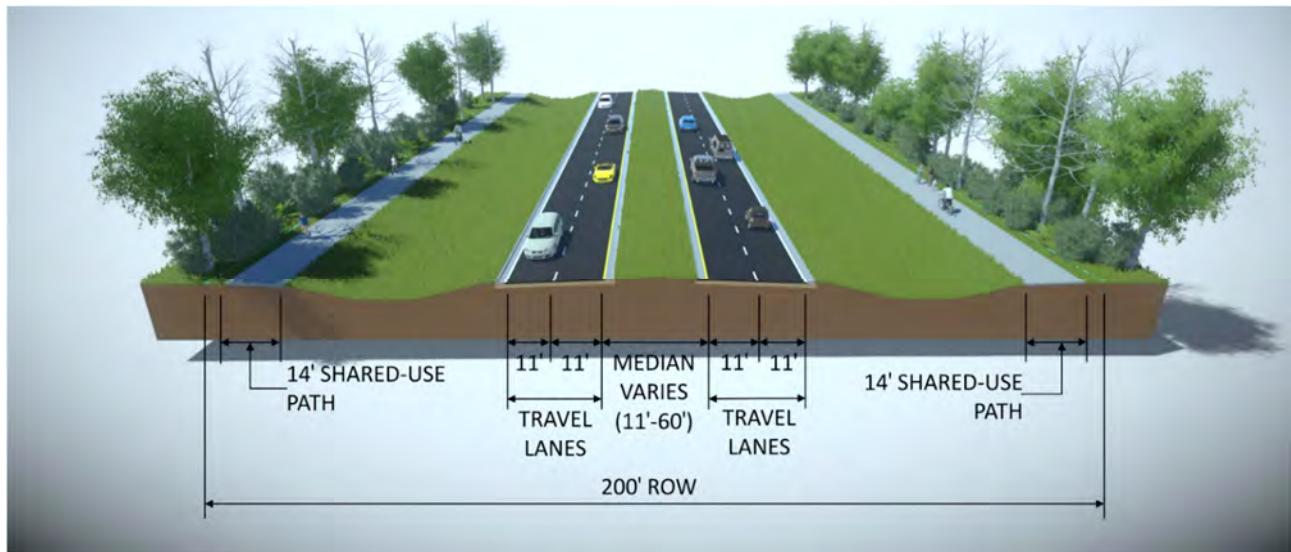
Segment 3 Typical Section (Cox Road to London Boulevard)
